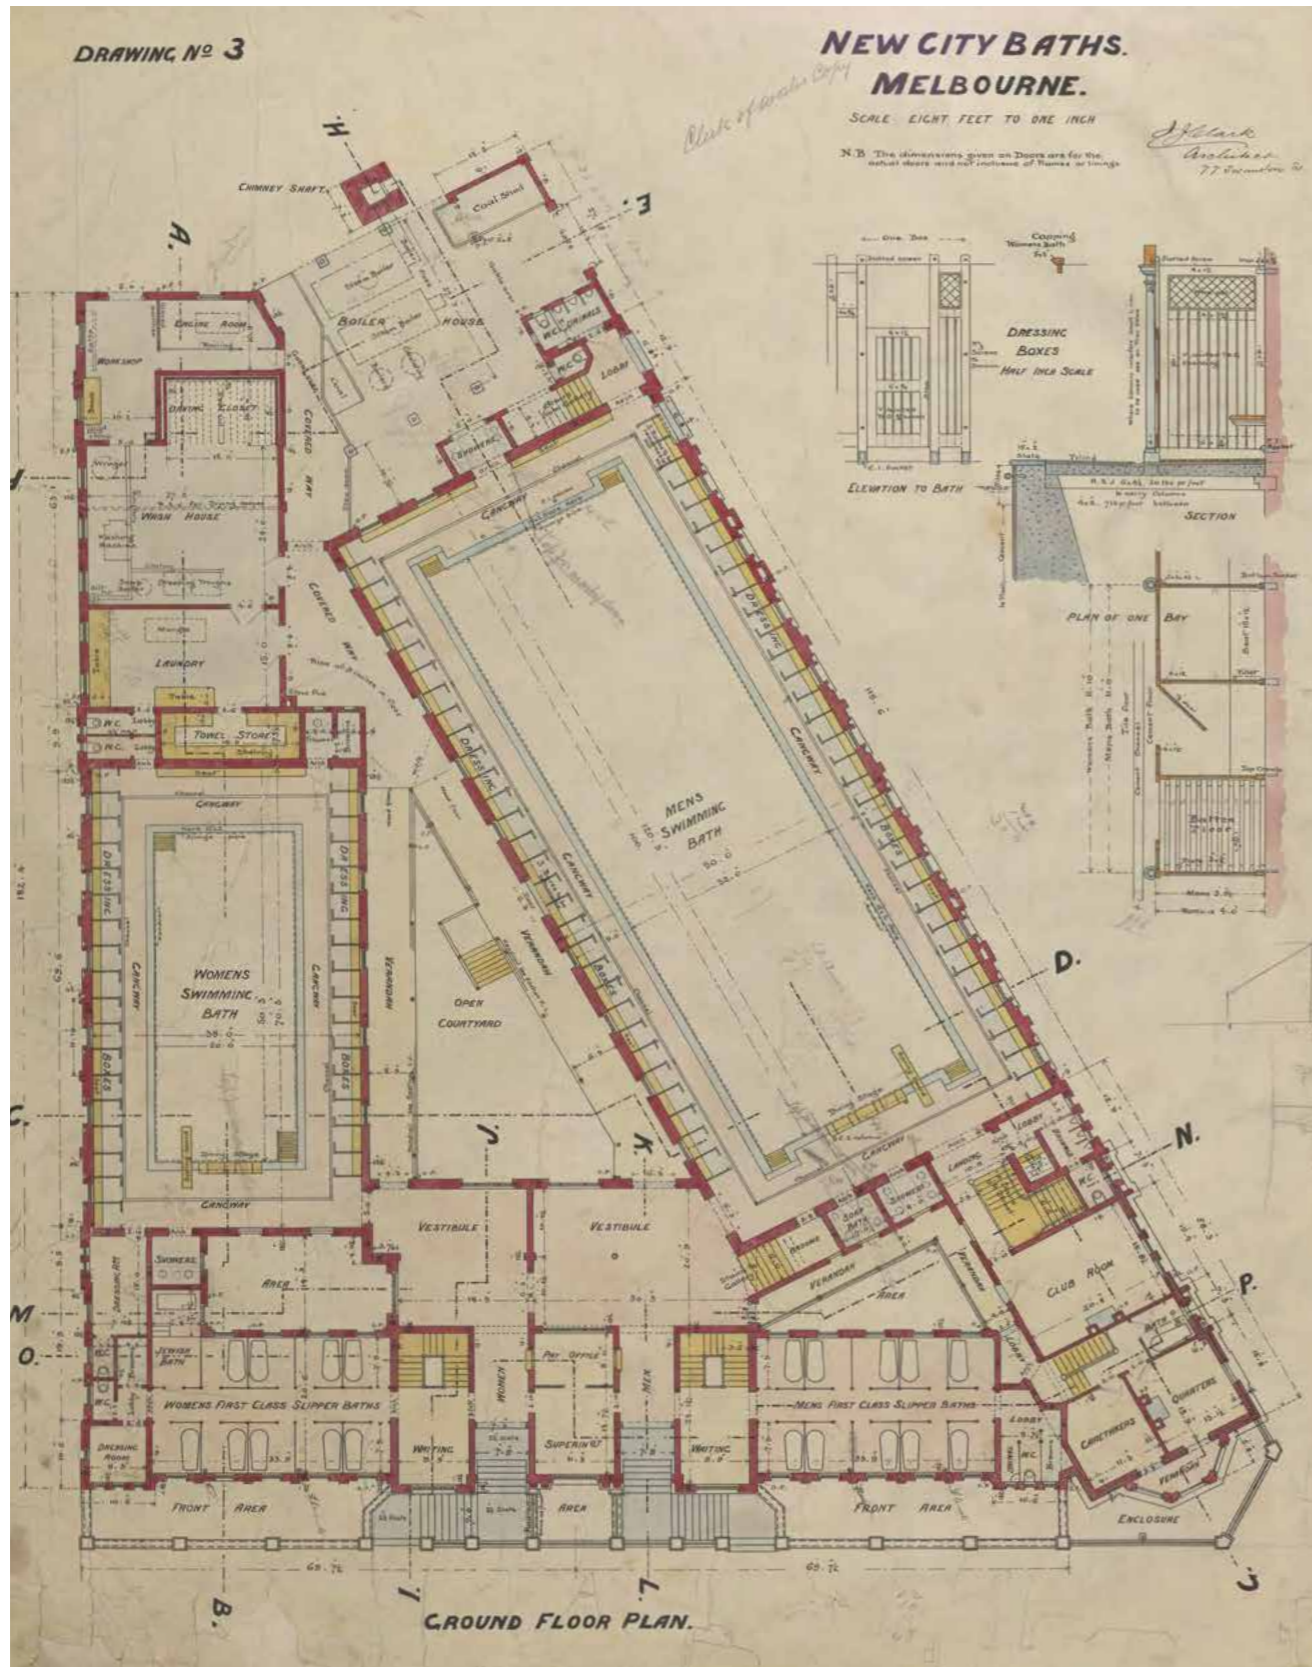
Drawing no. 3, Ground Floor Plan, New City Baths Melbourne, 1904
